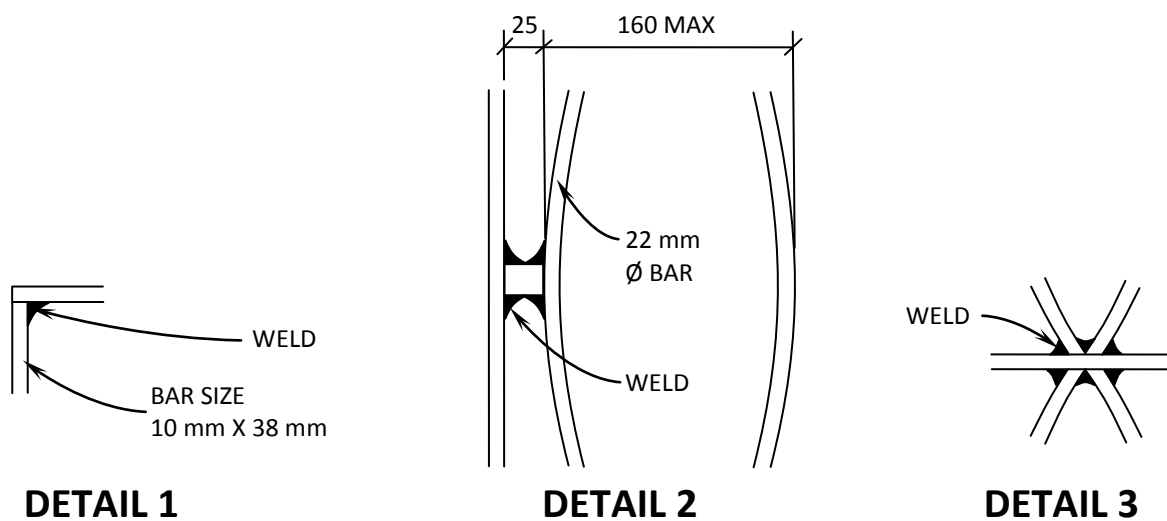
GRILLE WINDOW DESIGN AND DETAILS
